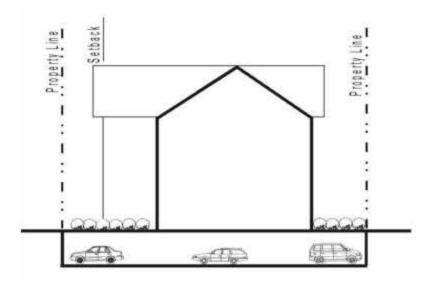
Figure Exception to 20.50.410(H)(1): Illustration of underground parking.
